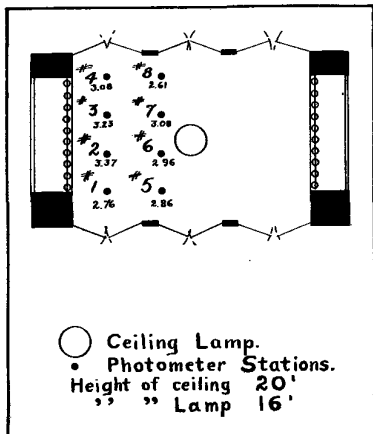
Section plan showing typical stairway, showing location of lighting units, test stations and illumination data.
